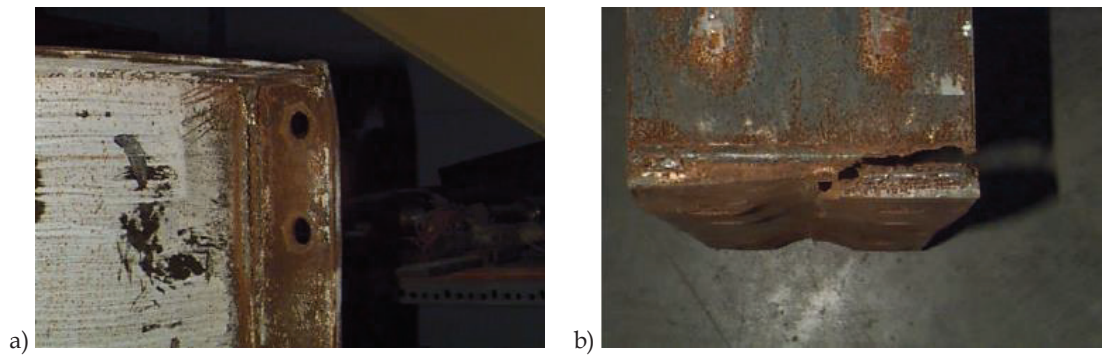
a) Web-to-End-Plate Weld Fracture - F2-3/4-3/8-16; b) Flange-to-End-Plate Weld Fracture - F2-3/4-3/8-16 (Boorse, 1999)
